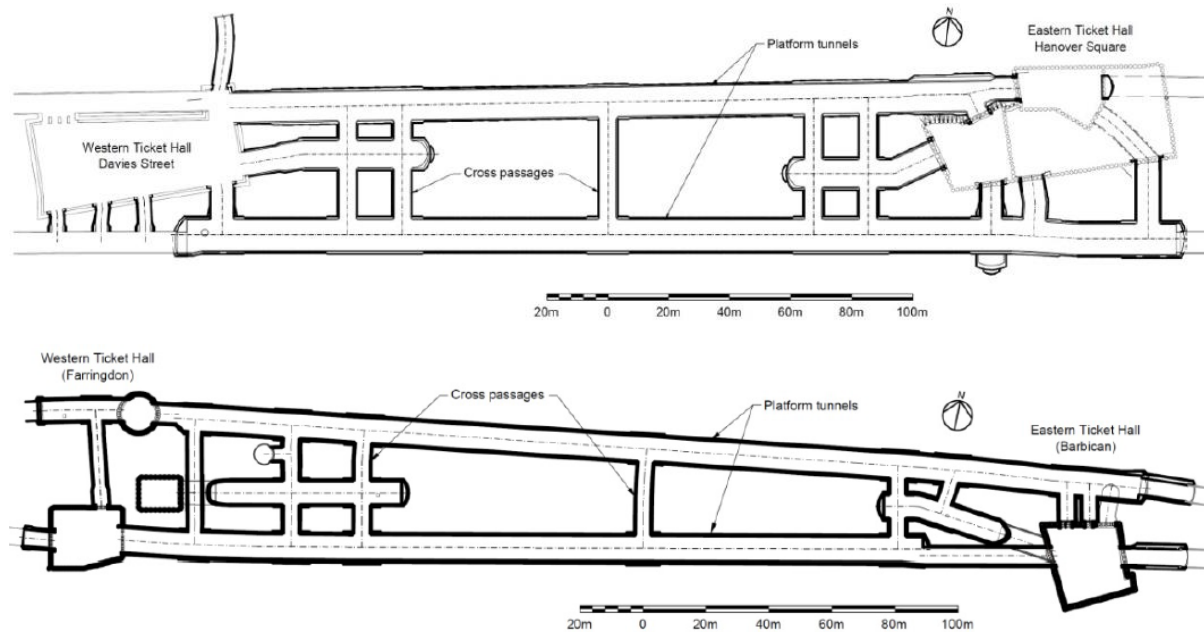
Station tunnels (Bond Street above, Farringdon below), [42]
